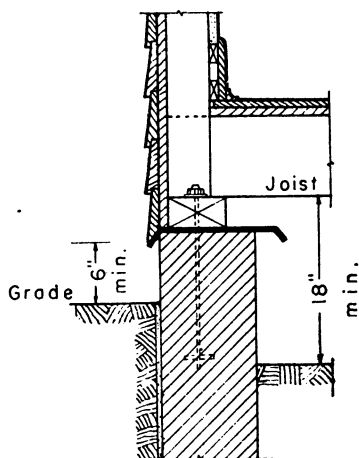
Bread-pan or through shield over uncapped brick wall.
